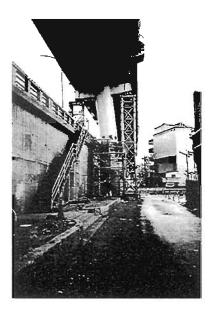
Ramp onto the Hanshin Expressway to the west of Kobe Steel column kinked at change in wall thickness near mid-height. Stabilised by welding on T-section "splints".
